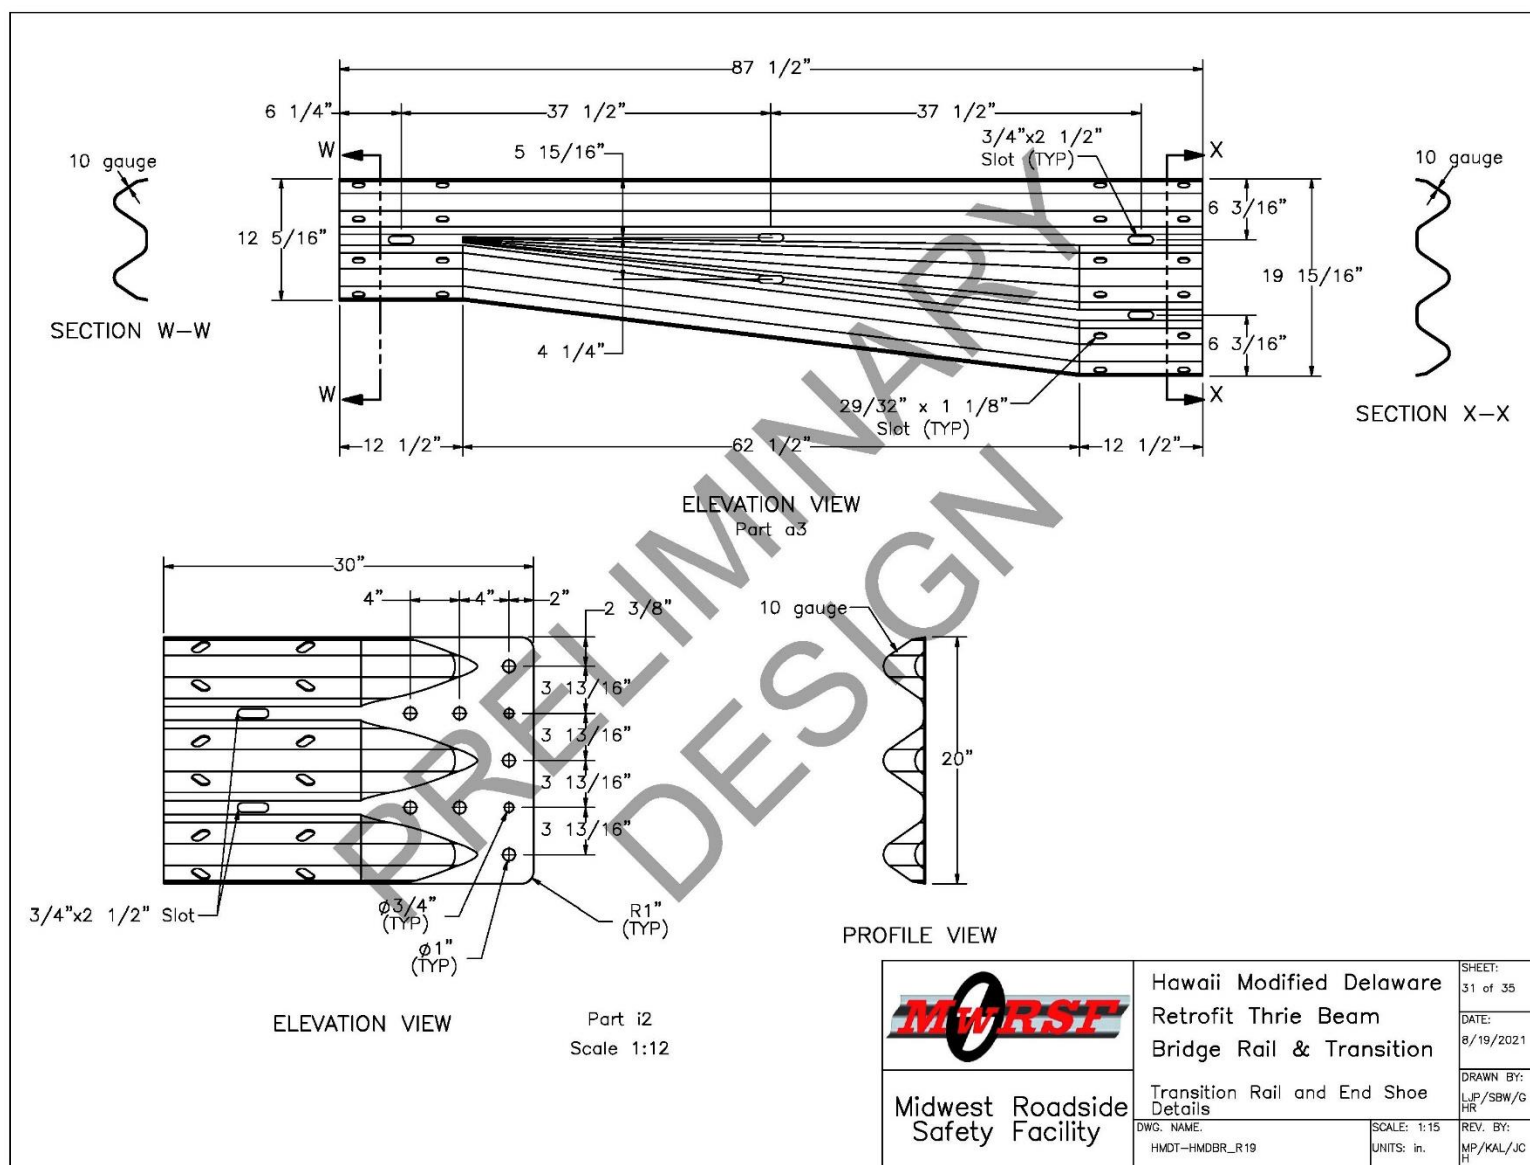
Transition Rail and End Shoe Details, Test No. HMDT-1
